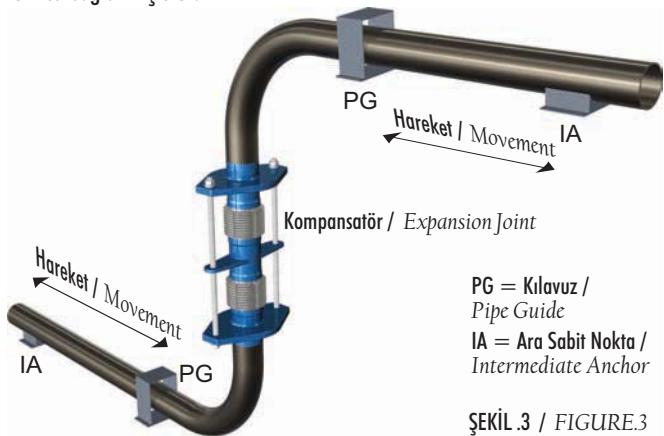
As depicted in the figure, pressure thrust is compensated by using limit rods installed at lateral expansion joints and intermediate anchors are used instead of main anchors. A planer pipe guide is used providing the thermal expansion in the vertical pipe leg to be taken as natural flexibility in the horizontal pipe run.
